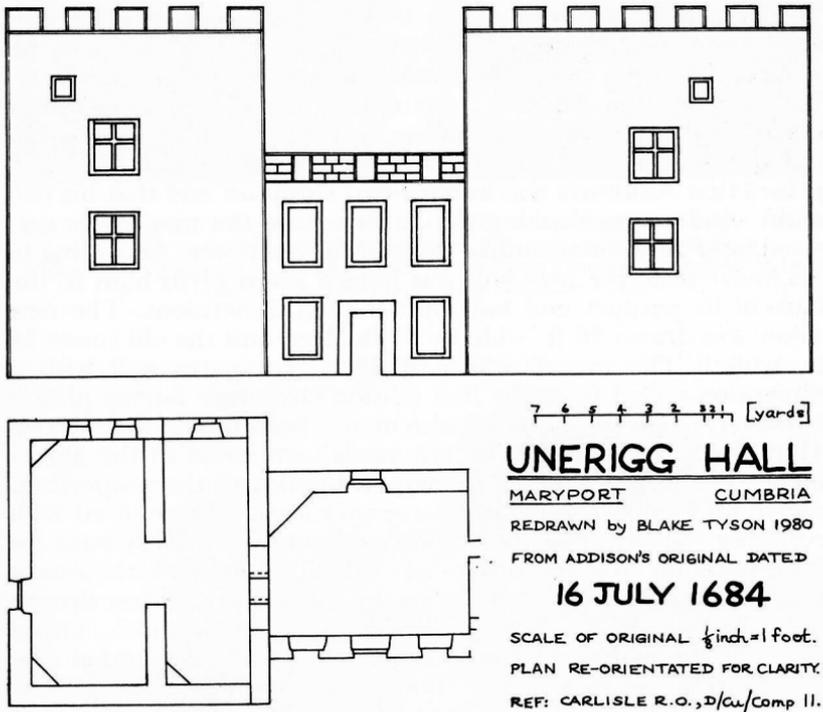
South-east elevation and plan of Unerigg Hall as designed in 1684 by John Addison of Barnard Castle.
